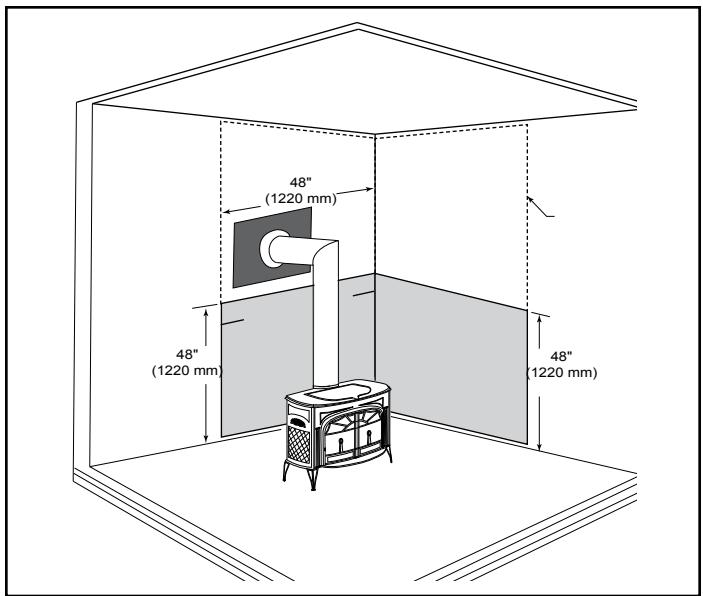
Parallel installation with rear wall pass-through, two wall shields. Reduced clearances to both rear and side walls. Wall shields may meet at corner if desired. Wall pass-through must comply with codes.
